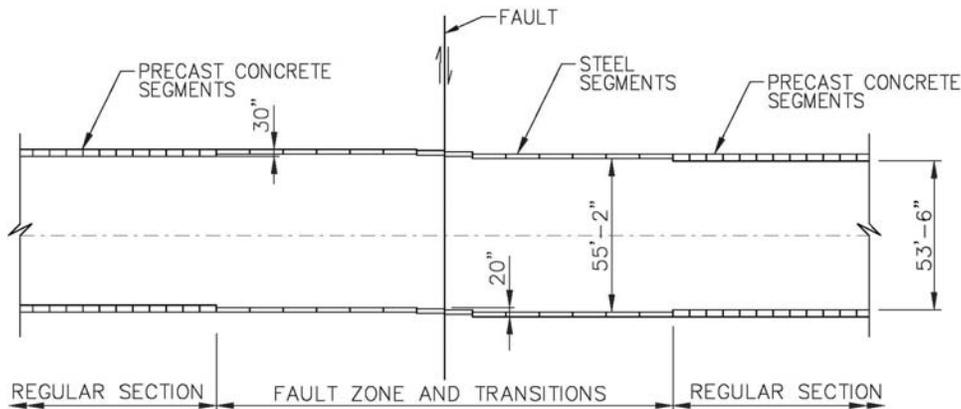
Vault Section at Raymond Fault Zone for LRT Alternative
